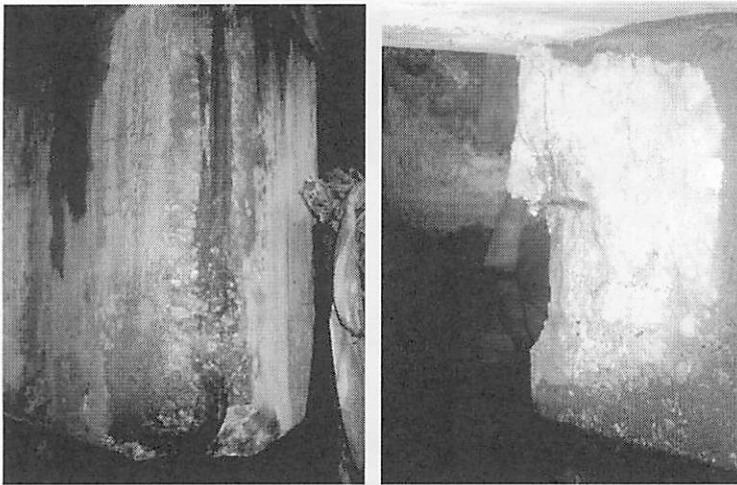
Spalling-out caused by corrosion of rebar
